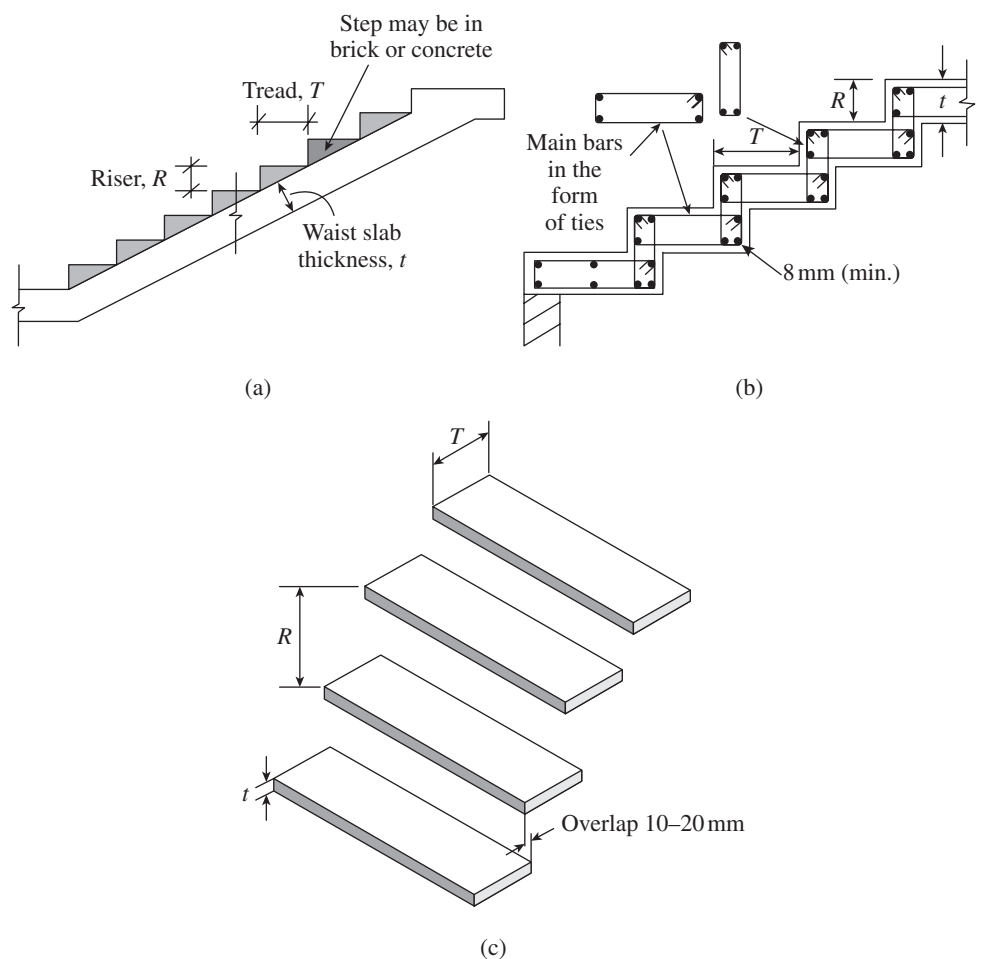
Type of steps (a) Steps on waist slab (b) Slabless tread-riser (c) Isolated steps
